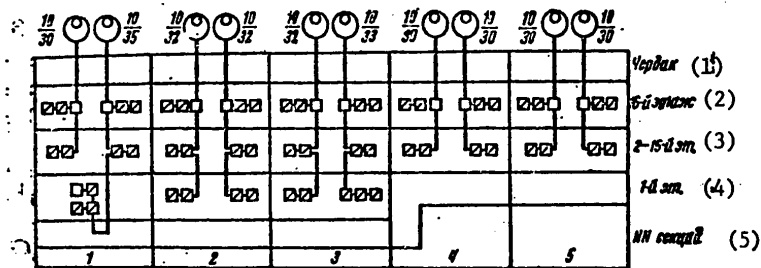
Schematic of the staircase wiring of a 16-story residential building
